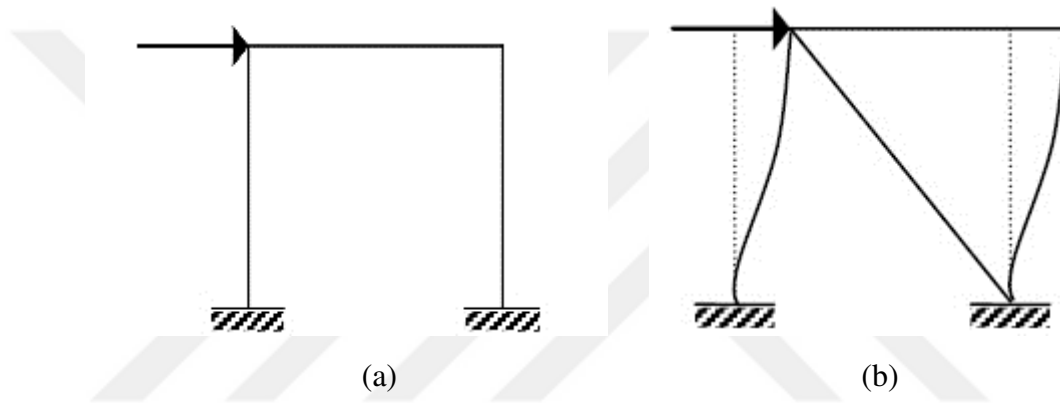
Modeling a frame subjected to horizontal load (a) without infill wall and (b) with infill wall (Akyürek, 2014)
